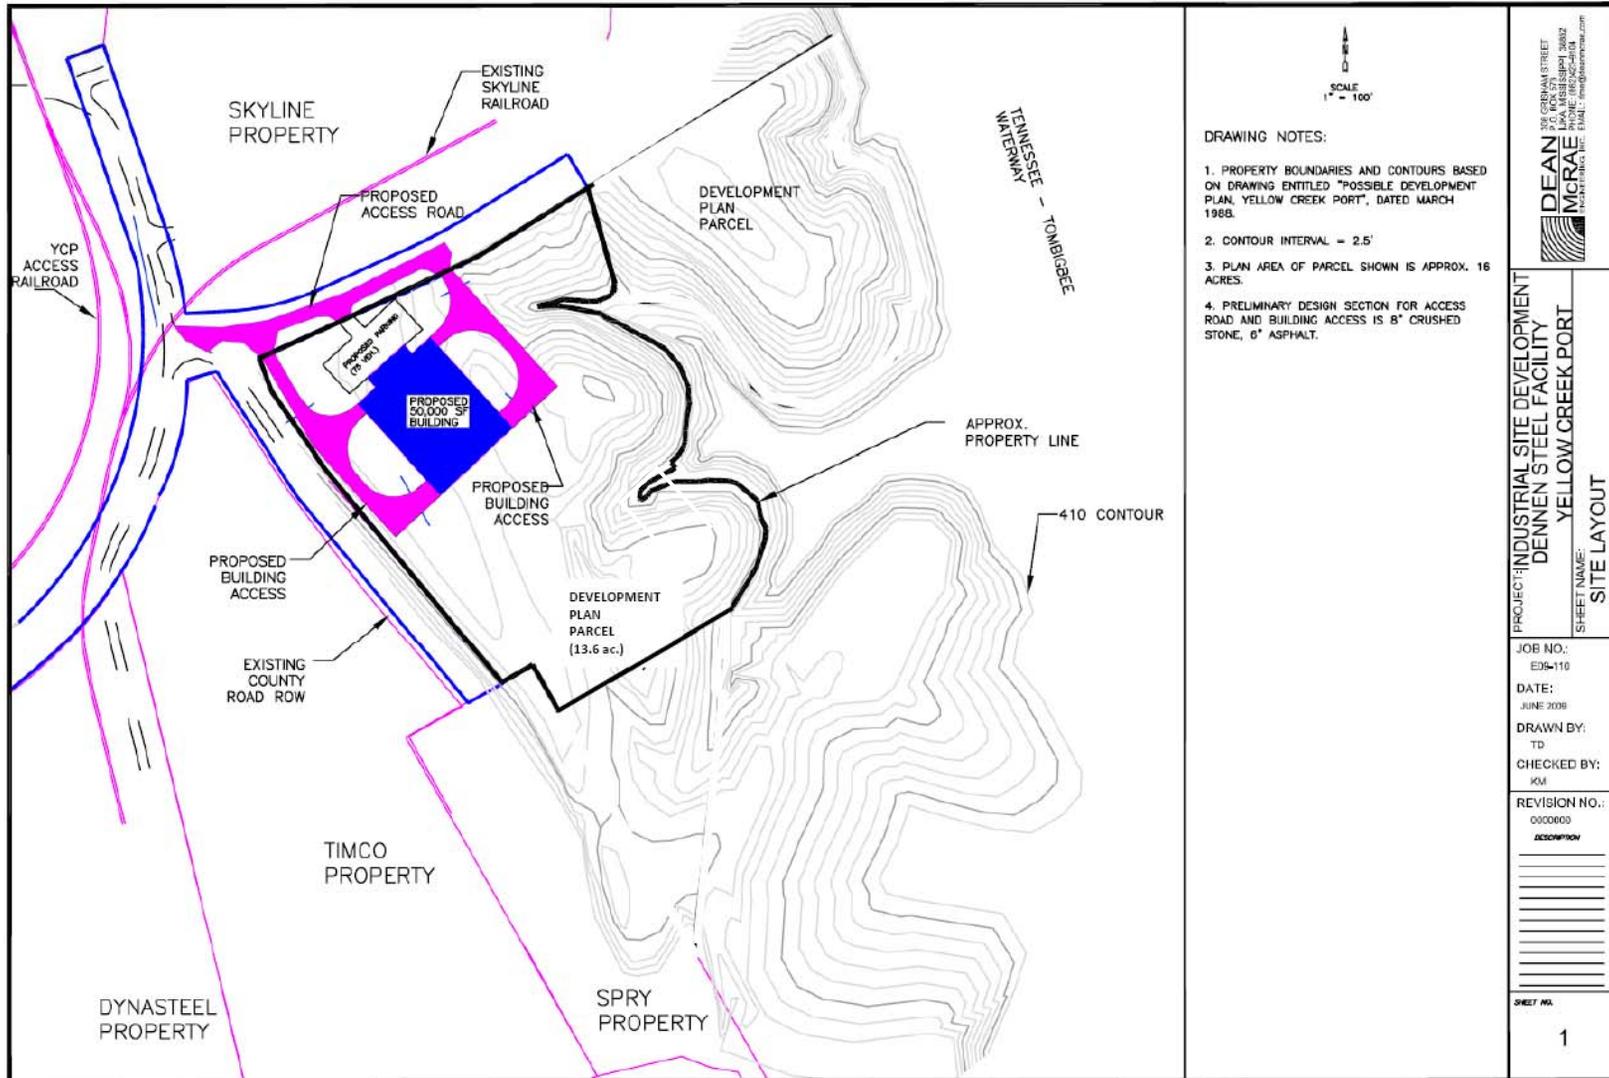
Proposed Layout - Dennen Steel Yellow Creek Facility
